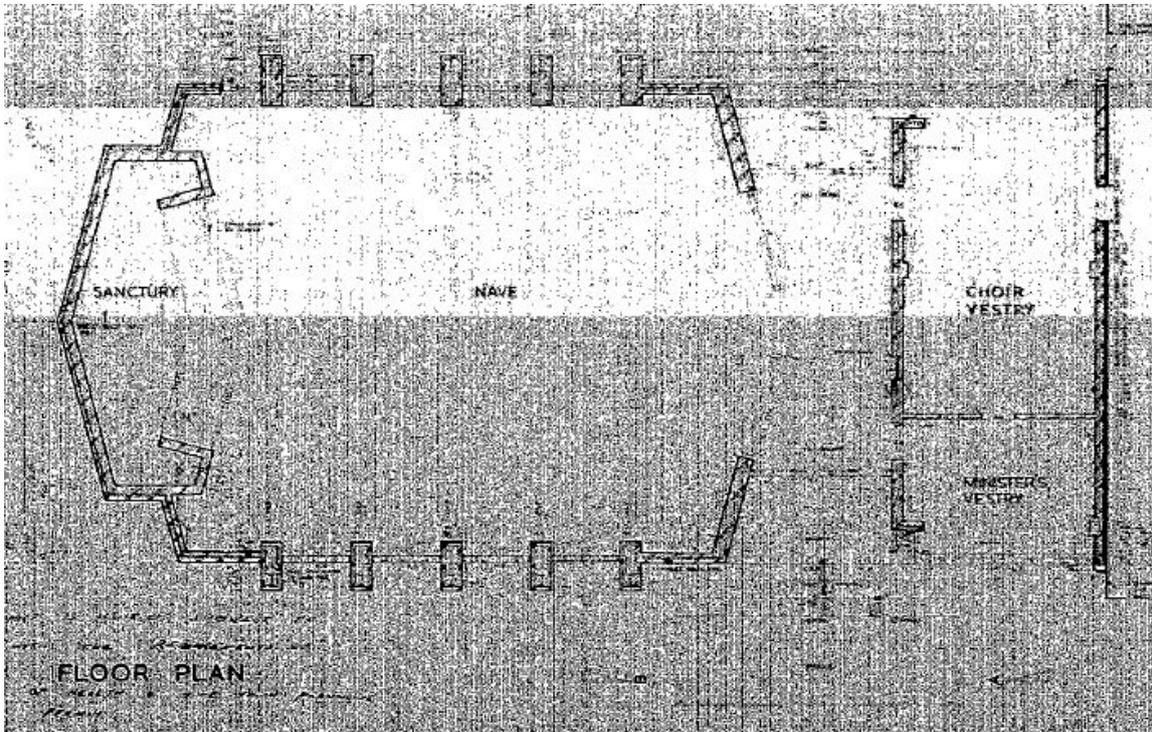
Floor plan of the 1963 church. (Source: City of Boroondara, Building Permit No 32135)
